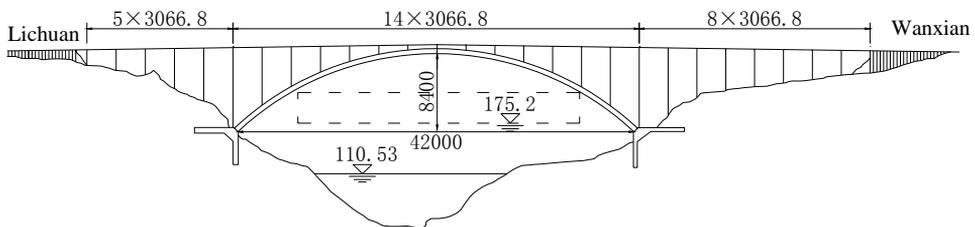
Elevation of the Wanxian Yangtze River Bridge (unit: cm)
